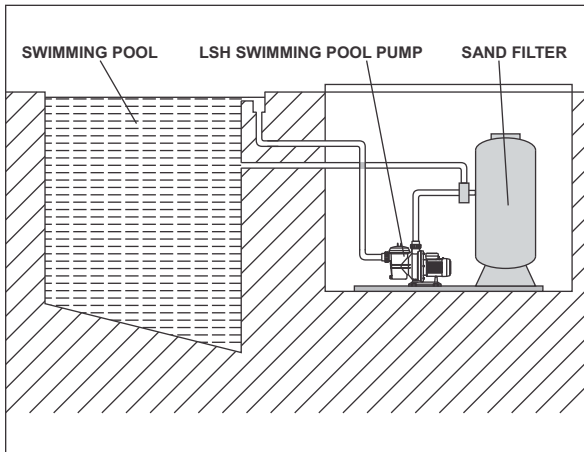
TYPICAL LSH PUMP INSTALLATION SYSTEM LAYOUT
